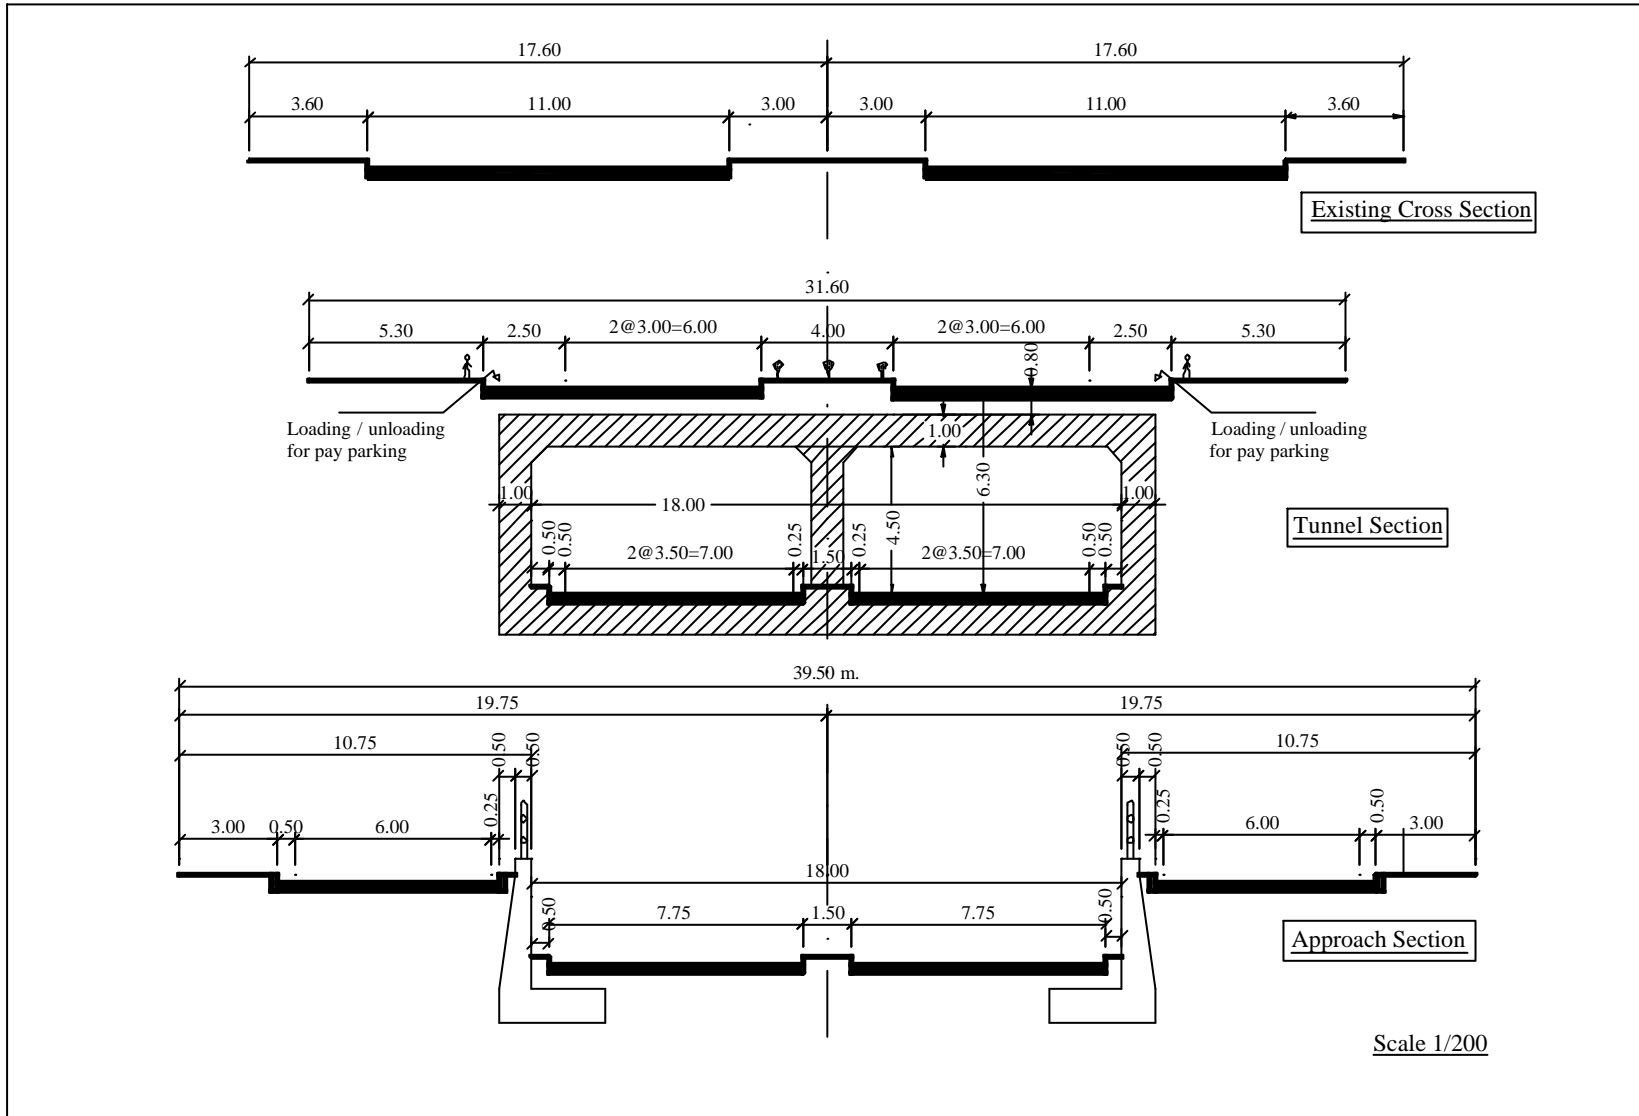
Proposed Cross Section Of Tripoli Blvd. Underpass
